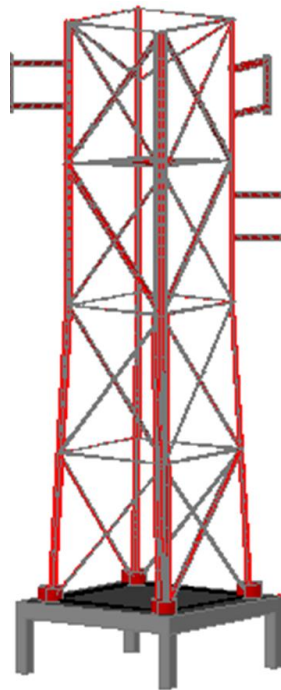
Telecommunication tower erected on RC roof slab specimen
